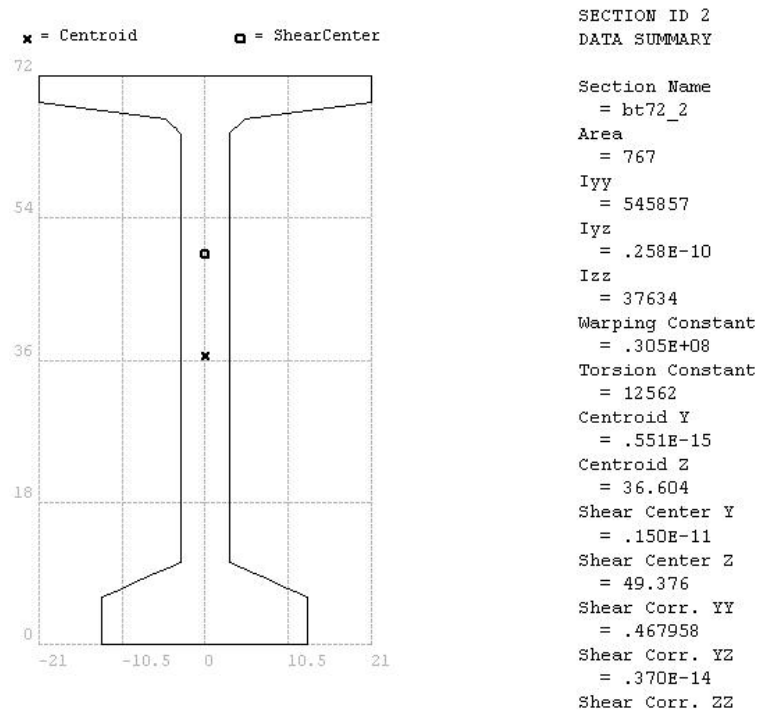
Cross Section of BT72 Girder (units are inches).
